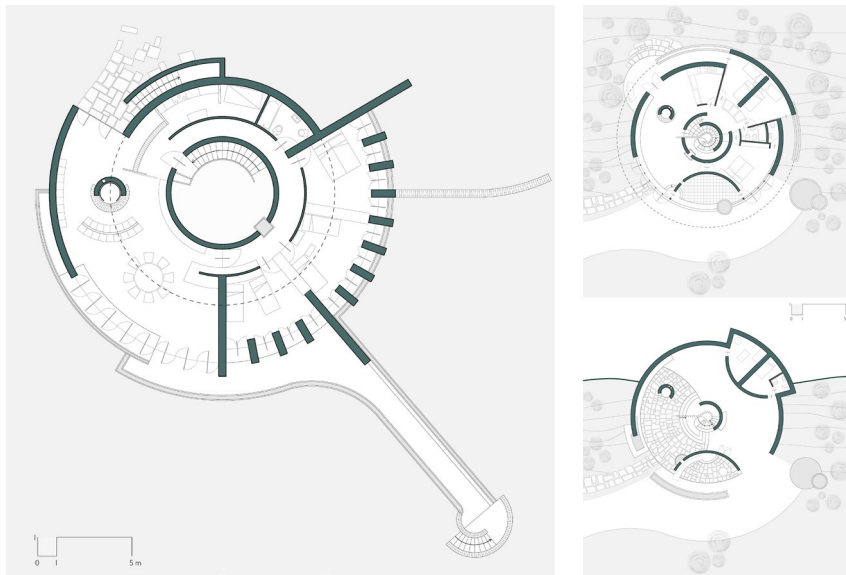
Villa Mainardis (1954-1955). a) First plan, initial project not realized (left); b) ground and upper floors, built solution (right). Graphic elaboration by the author.
